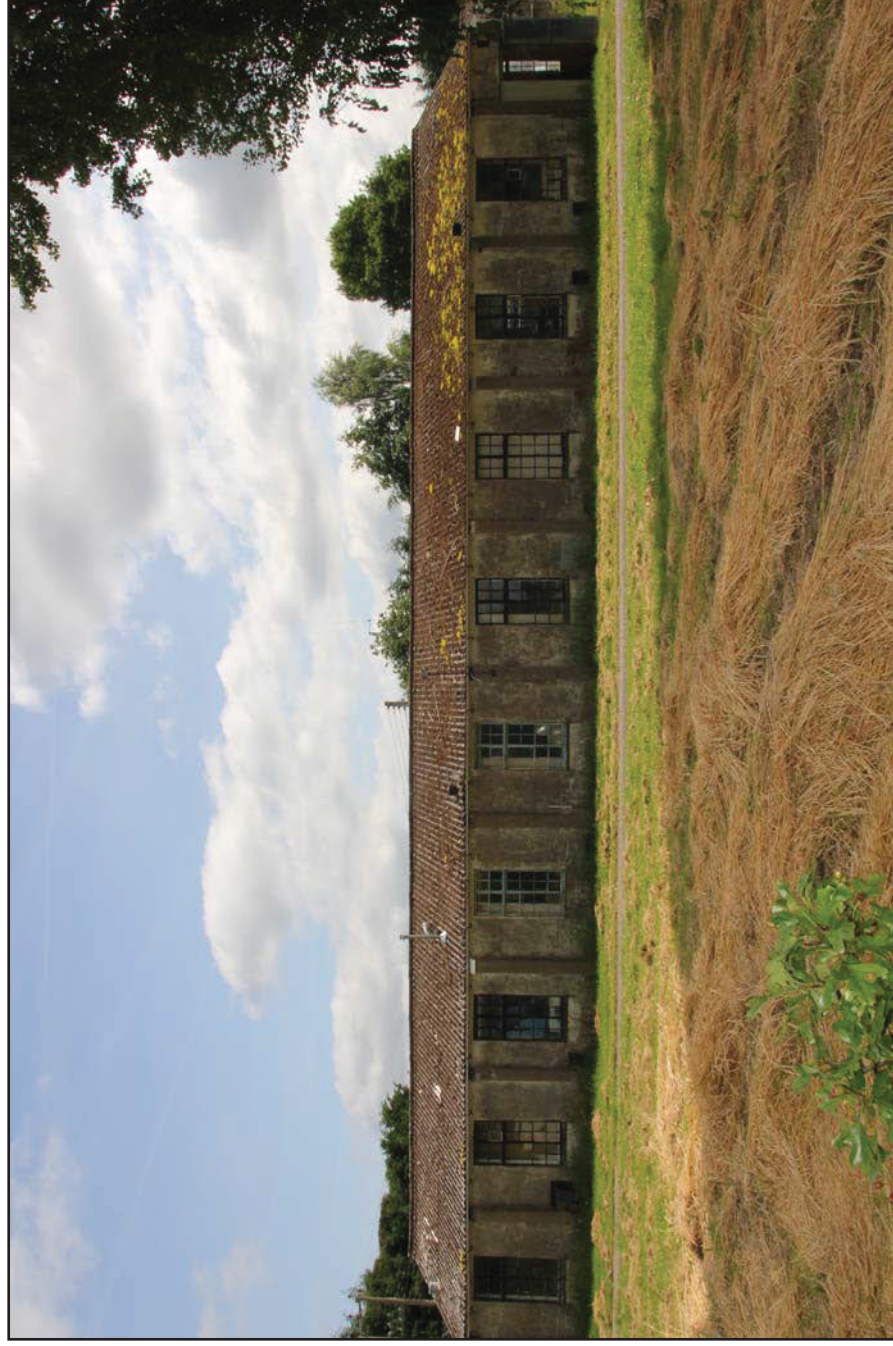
Building 2 northwest facing elevation, from the northwest. Scale 1.0m.
